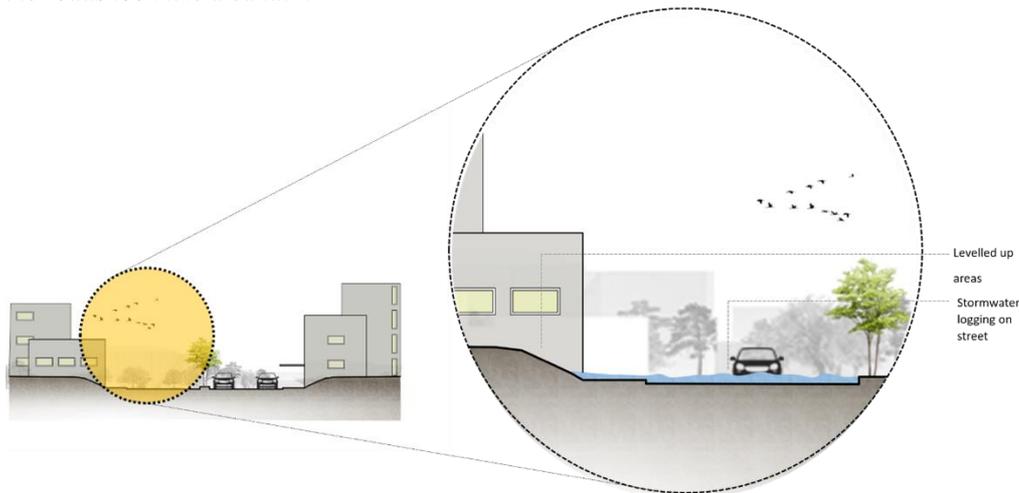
Illustration of how stormwater floods the street close to levelled land for buildings during heavy rainfalls. Conceptual section by the author.
